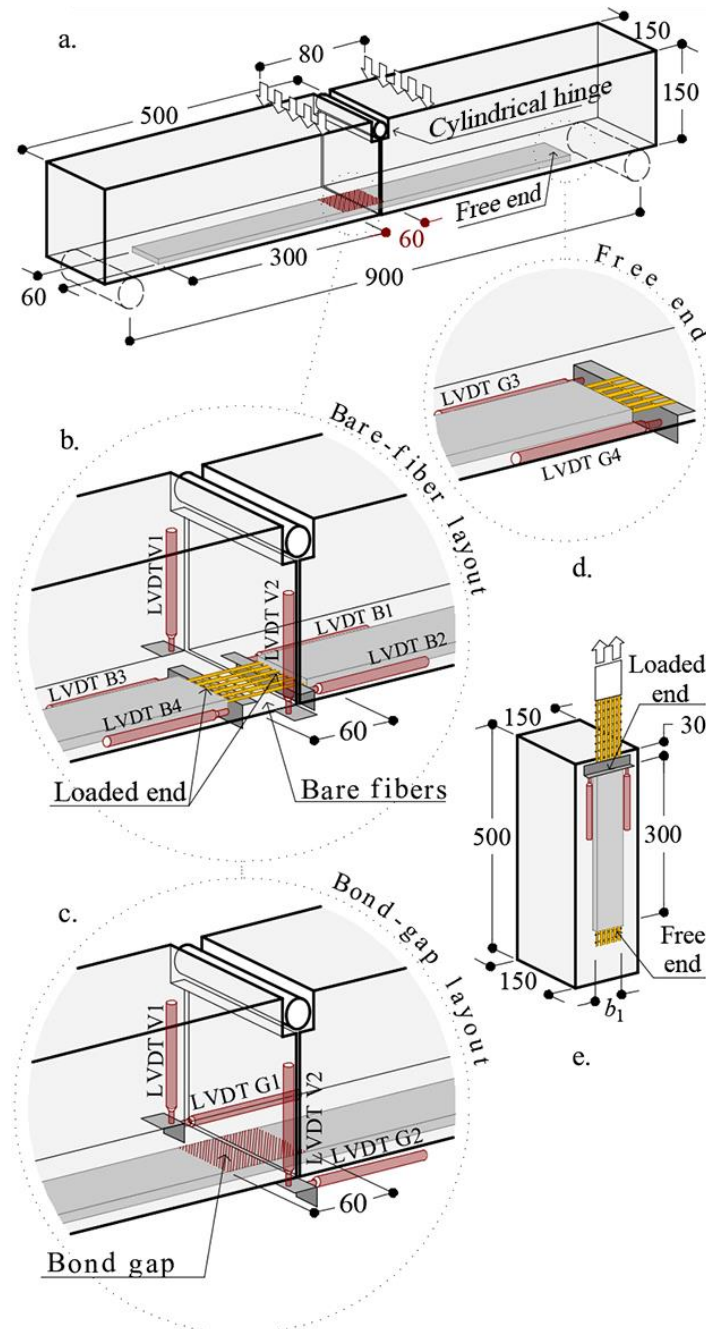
a) Modified beam test geometry and set-up: b) bare-fiber, c) bond-gap specimen midspan, and d) detail of the free end. e) Direct shear test geometry and set-up (dimensions in mm).
